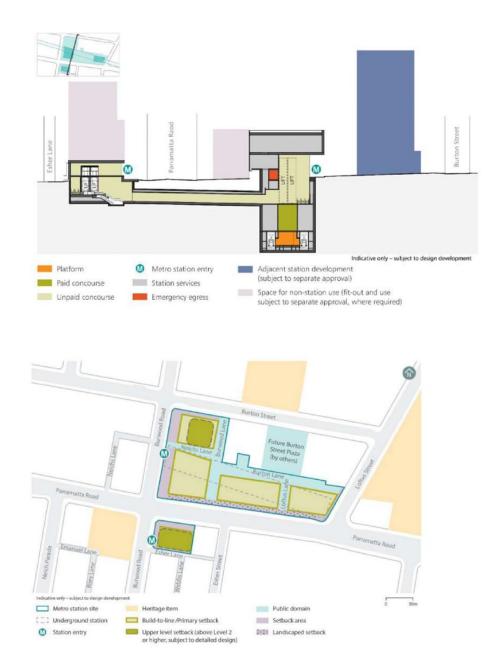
Indicative Burwood North precinct layout and built form envelope approved under Stage 3 CSSI for Sydney Metro West Rail infrastructure, stations, precincts and operations (SSI-22765520)
